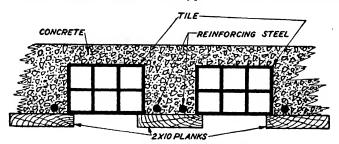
Cross-Section View, Showing Forms, Reinforcing Steel, and Tile Used in Floor Construction
